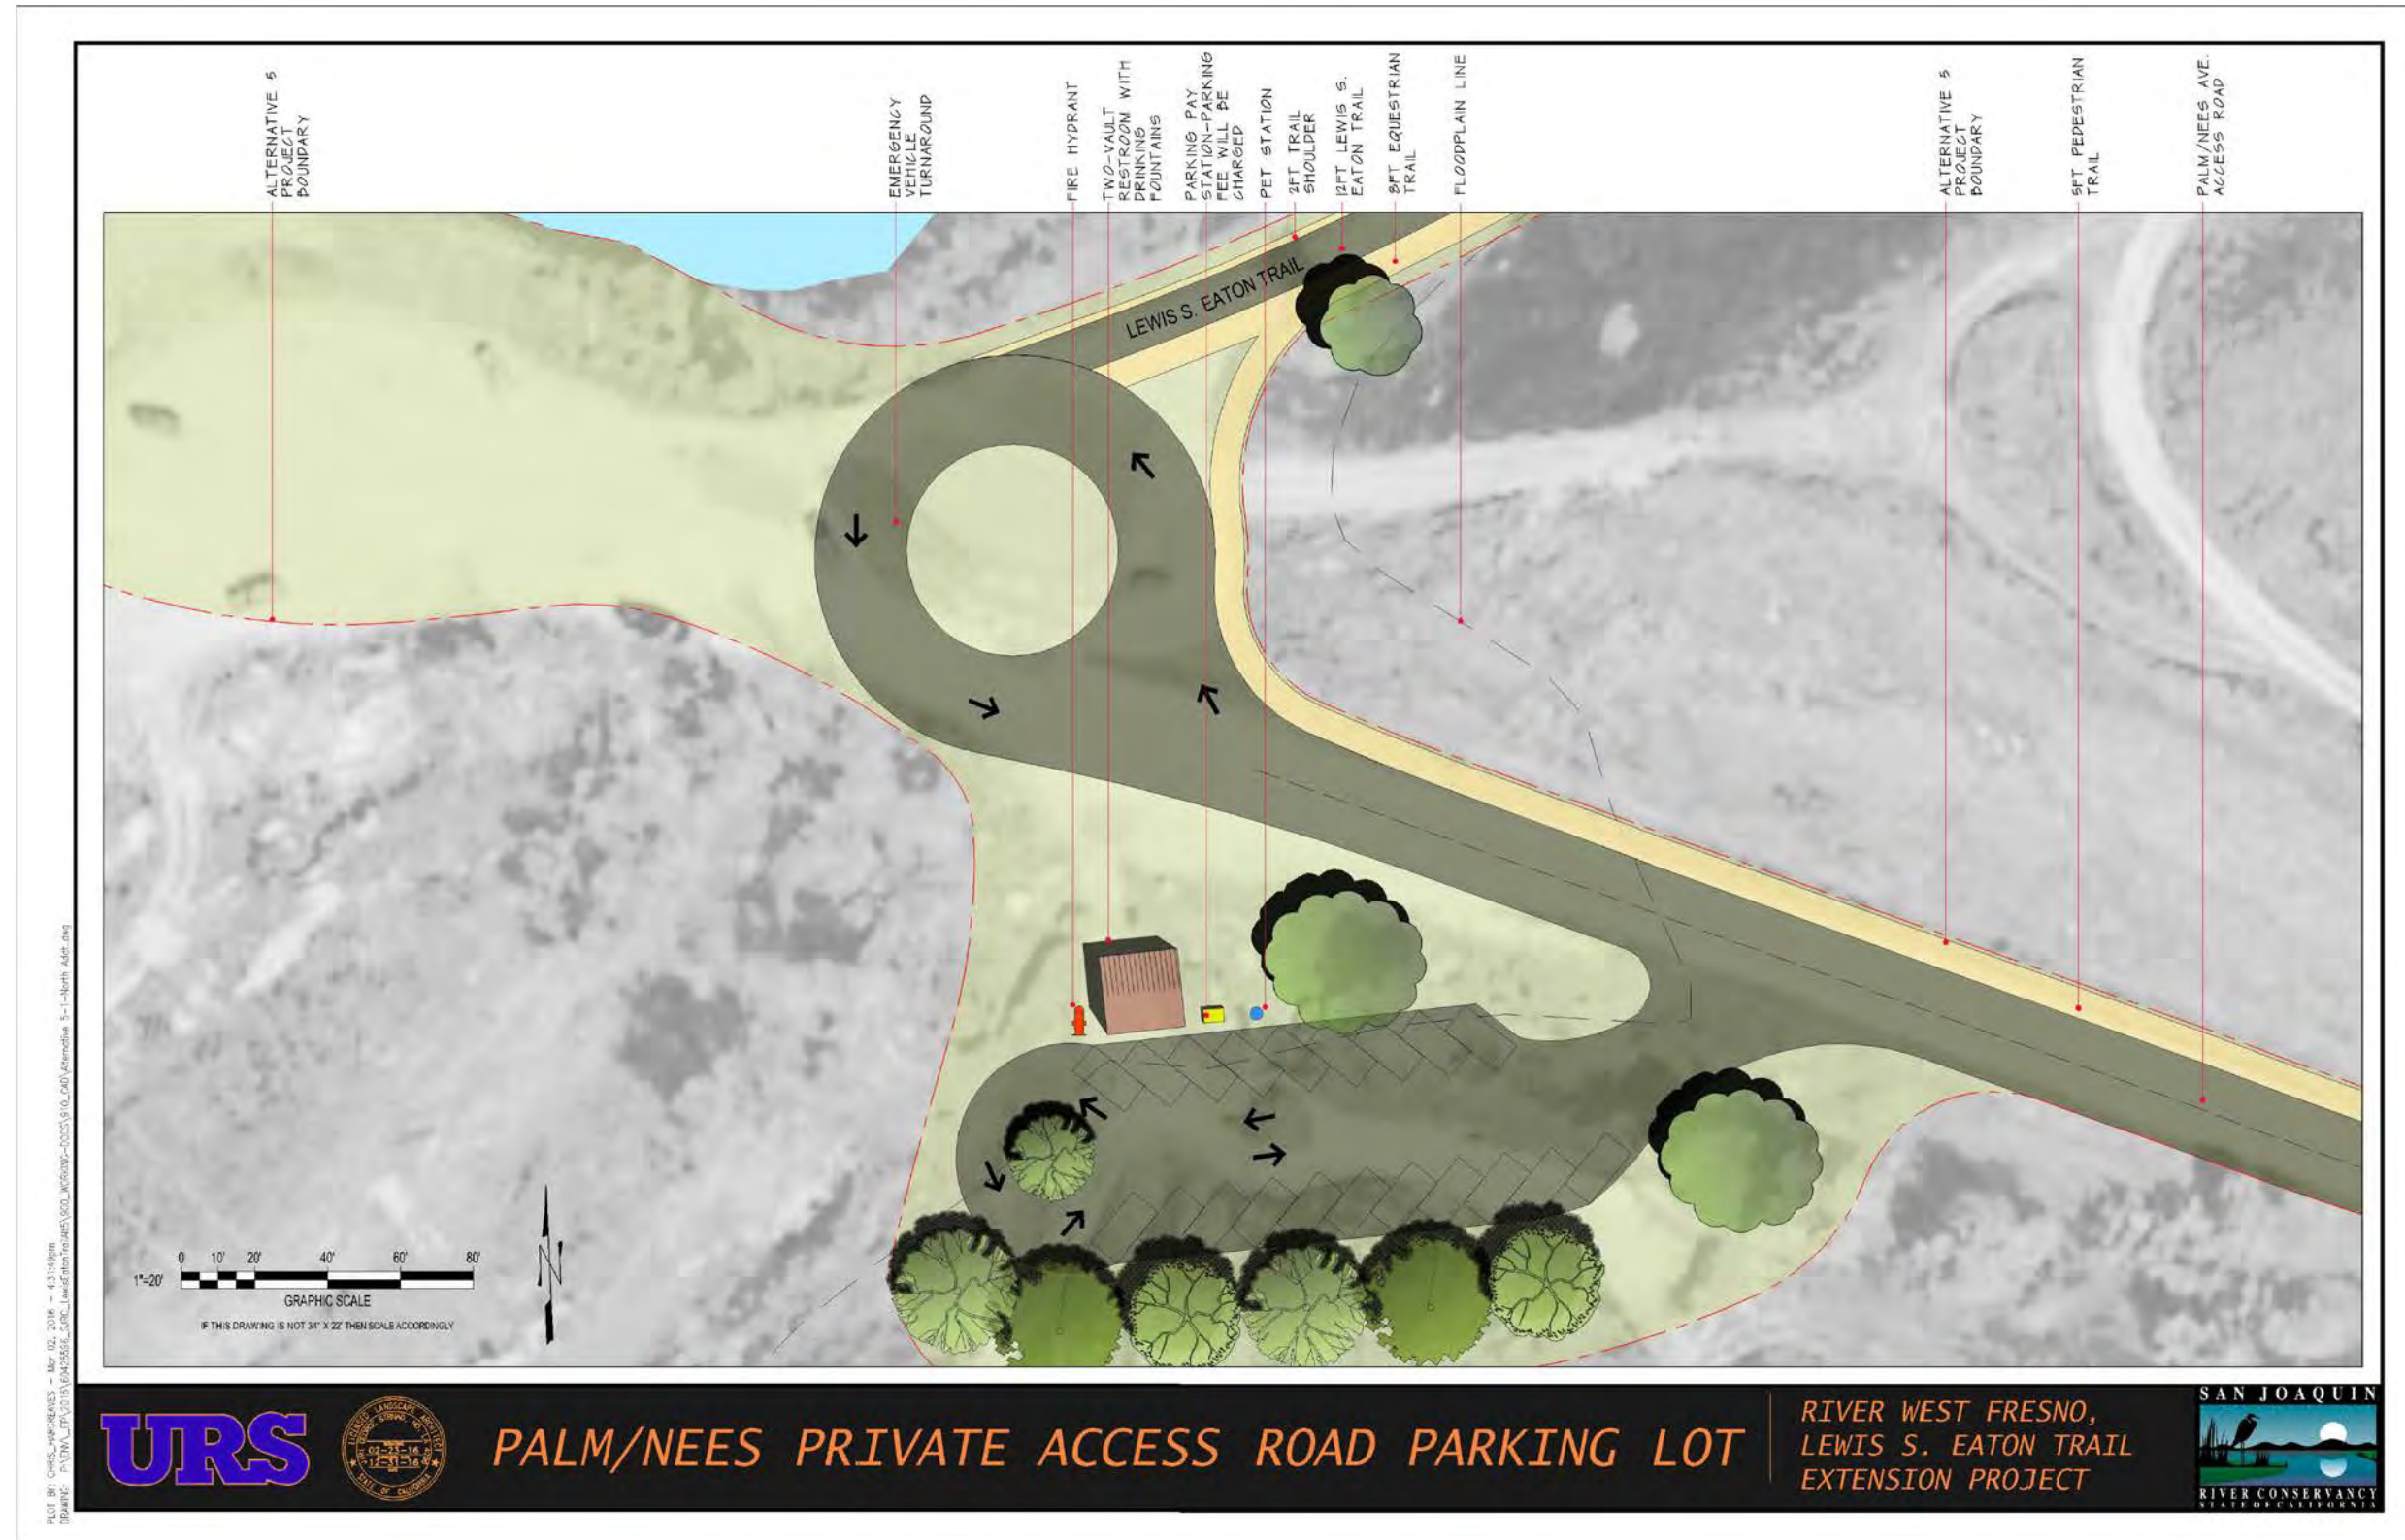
Palm/Nees Private Access Road Parking Lot
